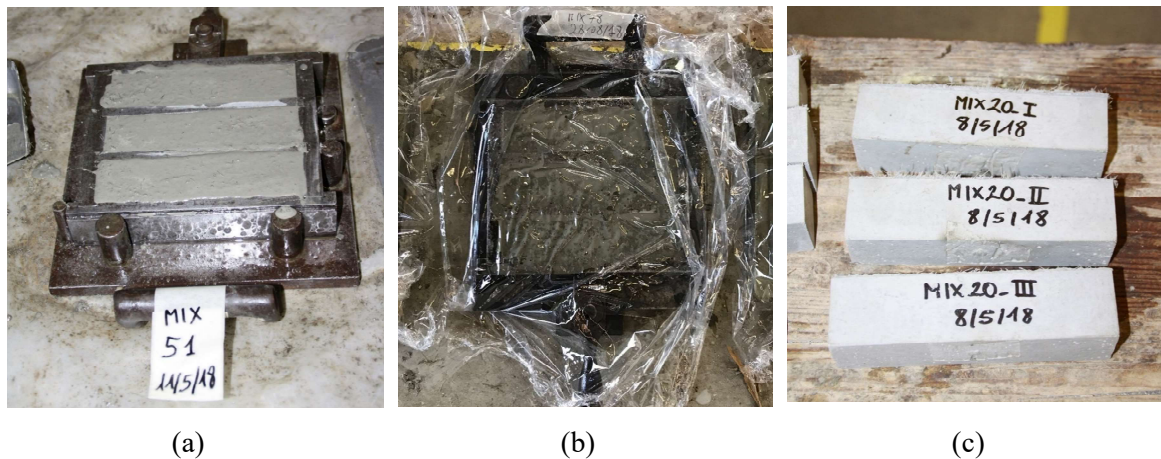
Stages of the HPFRC casting procedure: (a) Admixture placed in moulds; (b) Cover with plastic sheets; (c) Specimens demoulded.
